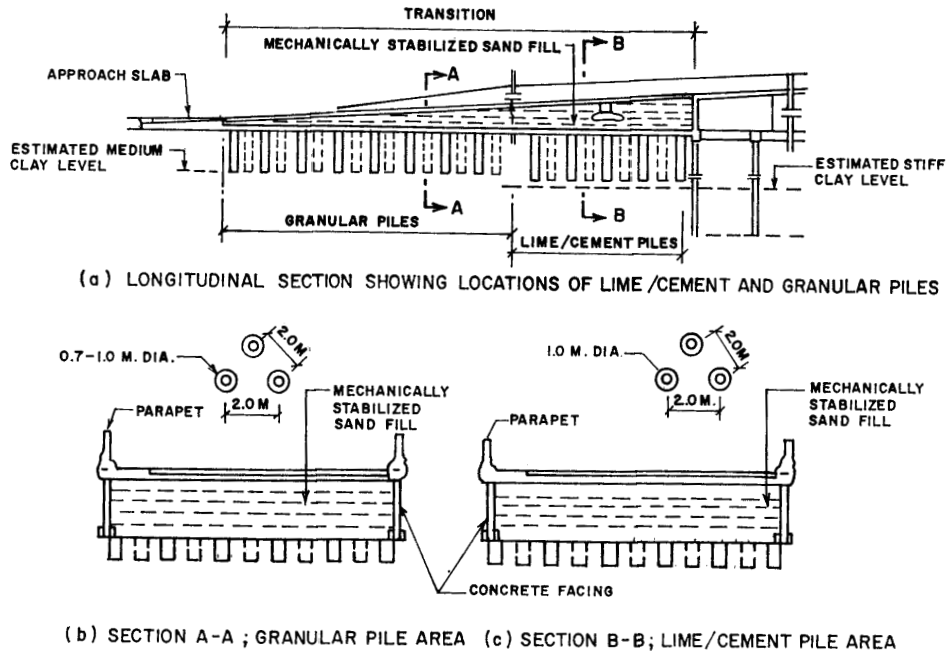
Schematic of Granular Compaction Piles with Mechanically Stabilized Earth to Support Bridge Approach Embankments (Bergado et al., 1996)
